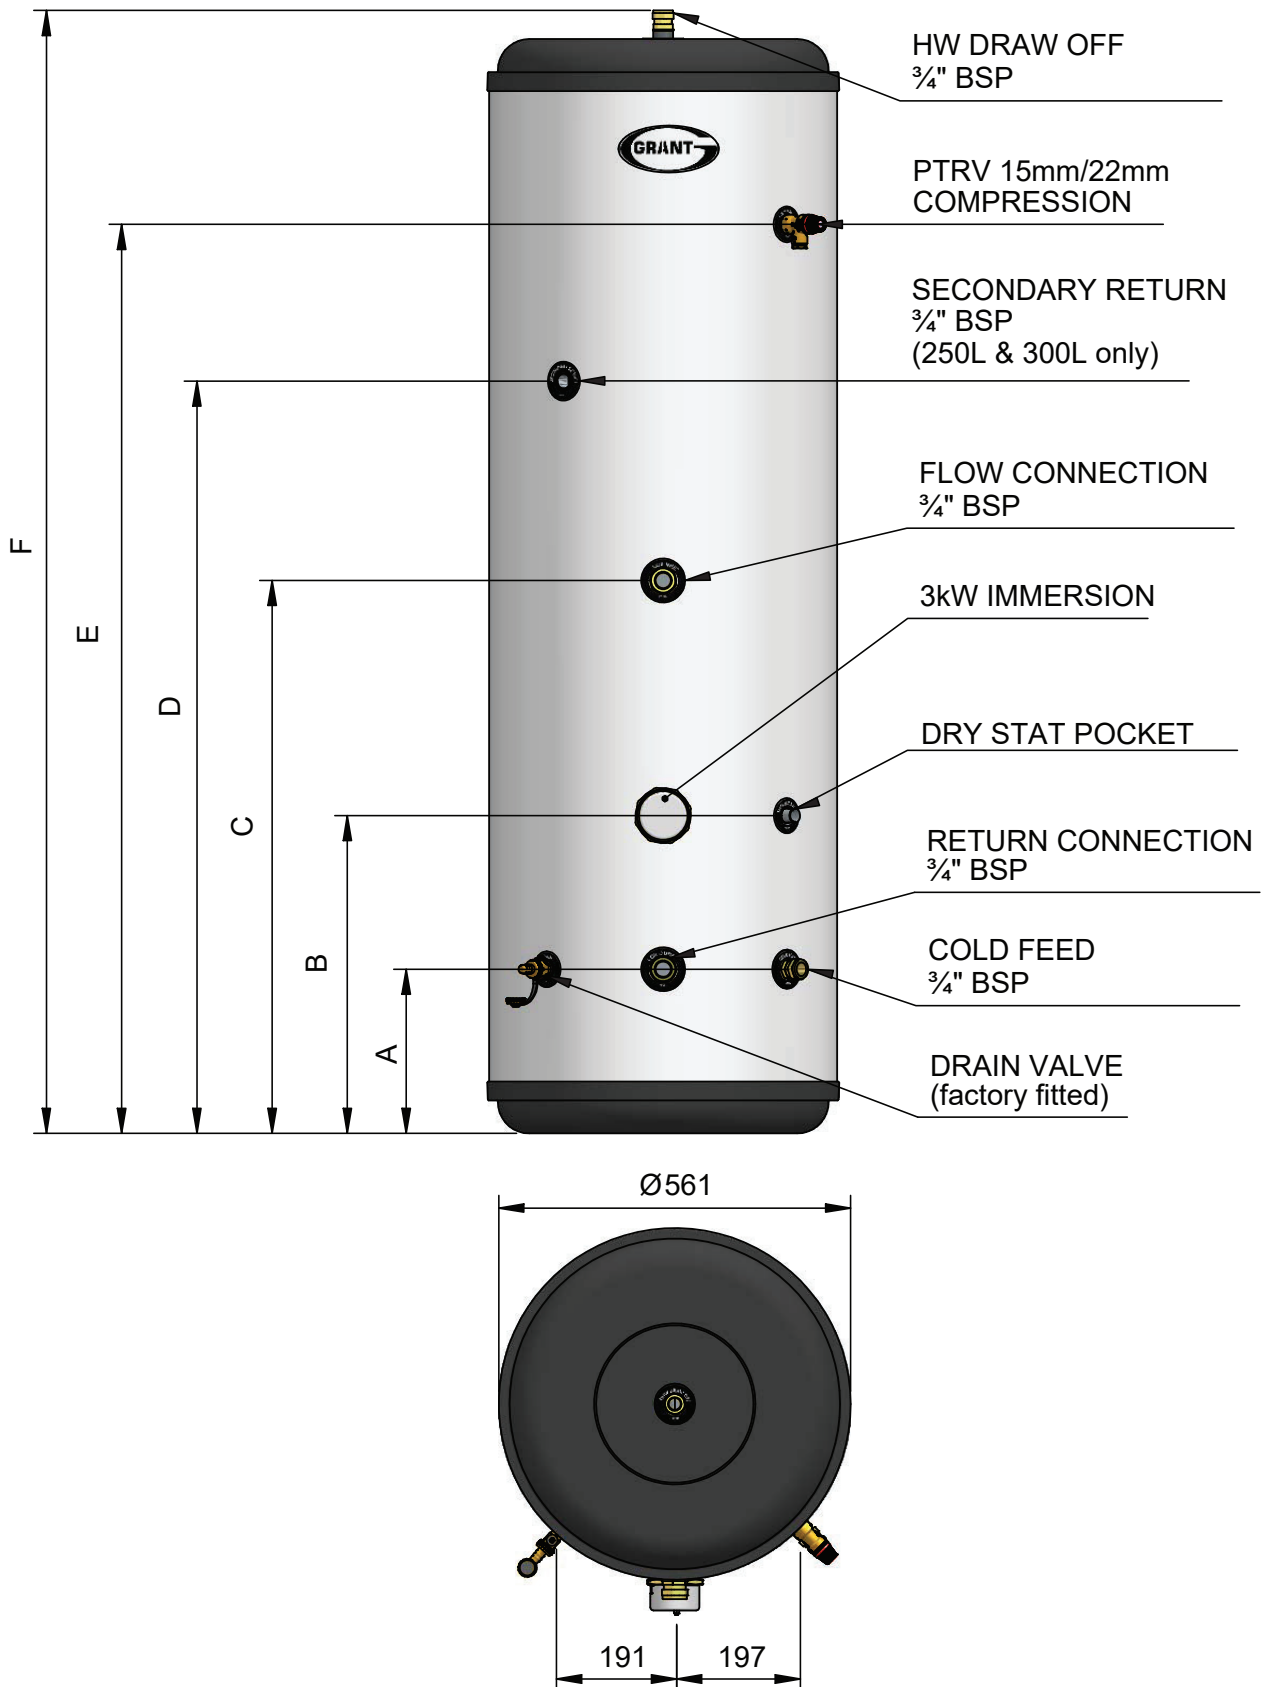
Grant QR single coil Heat Pump cylinder dimensions
